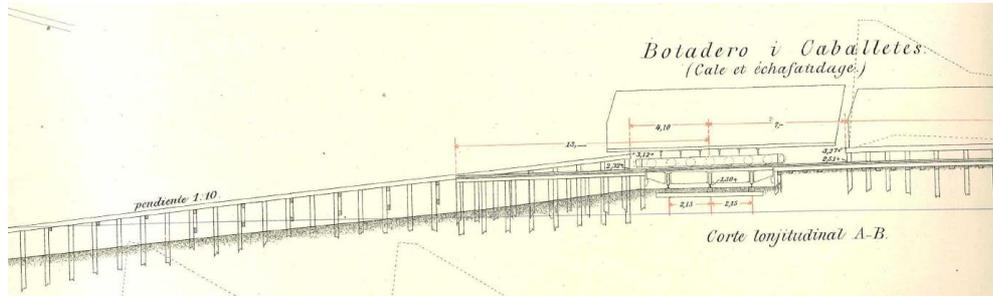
Transport and launching plans of the caissons (Valparaíso, 1903)
